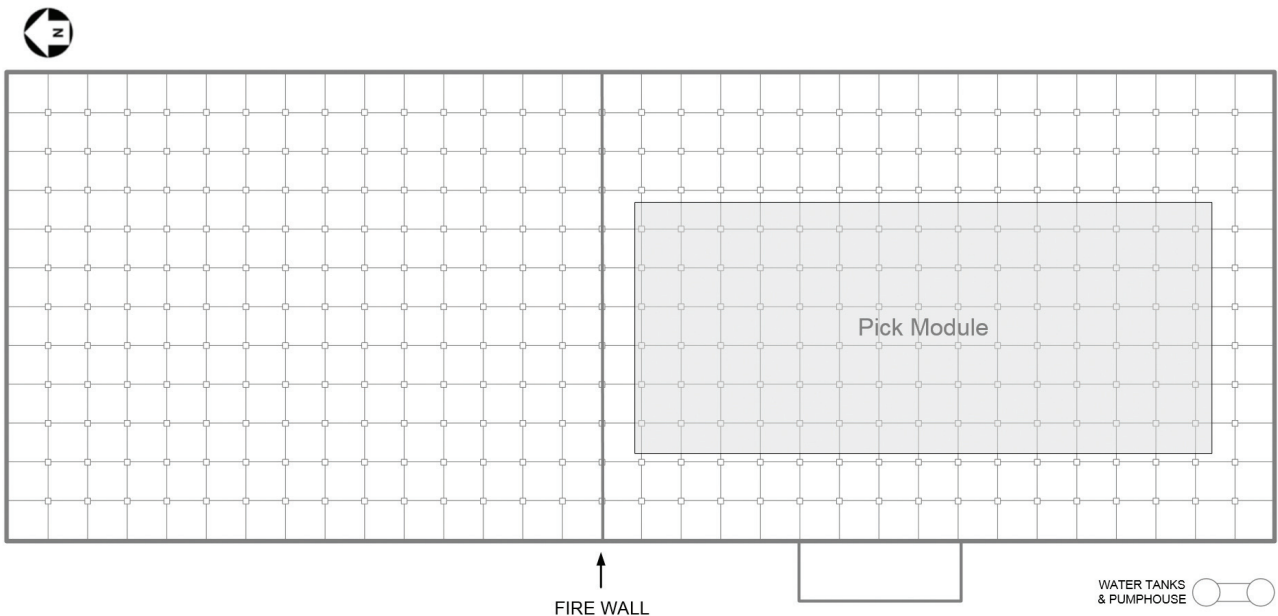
The Pick Module occupied most of the section of the building south of the fire wall.
